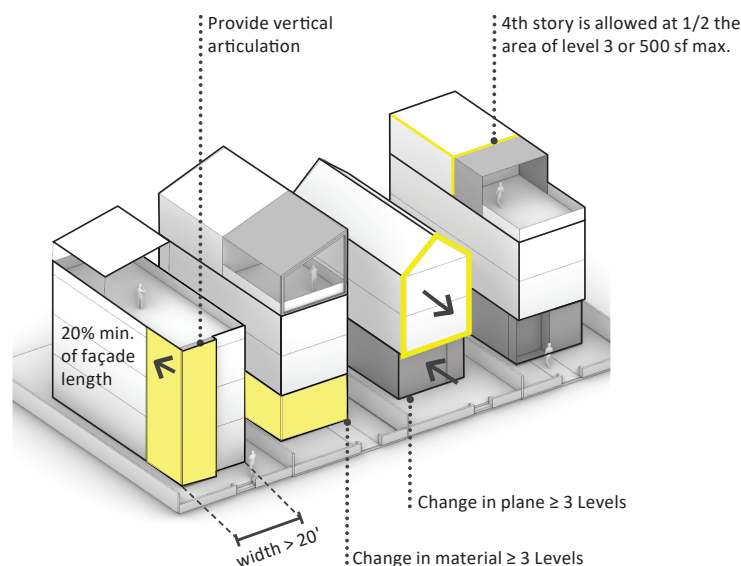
BUILDING MODULATION & ARTICULATION
